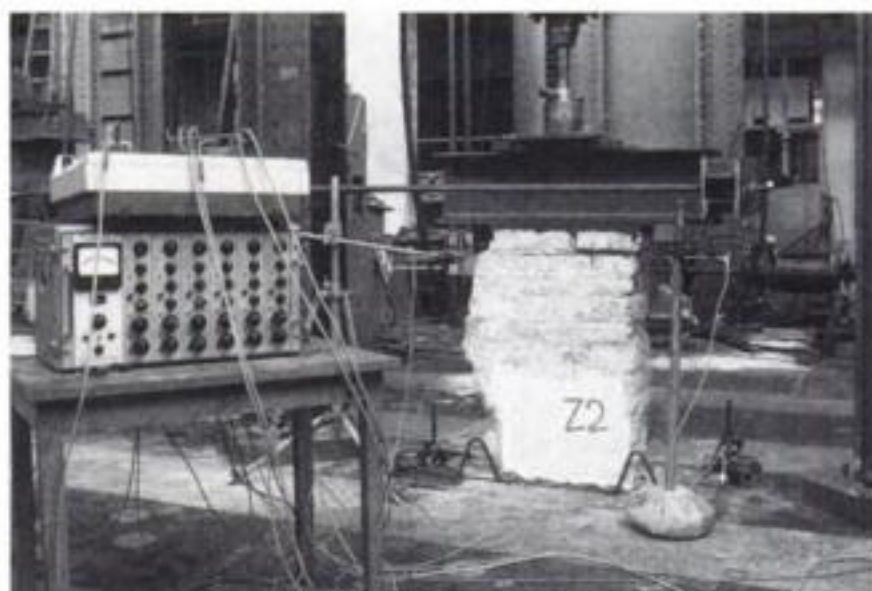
Lateral resistance test of a brick-masonry specimen, cut from the building, in the laboratory.
